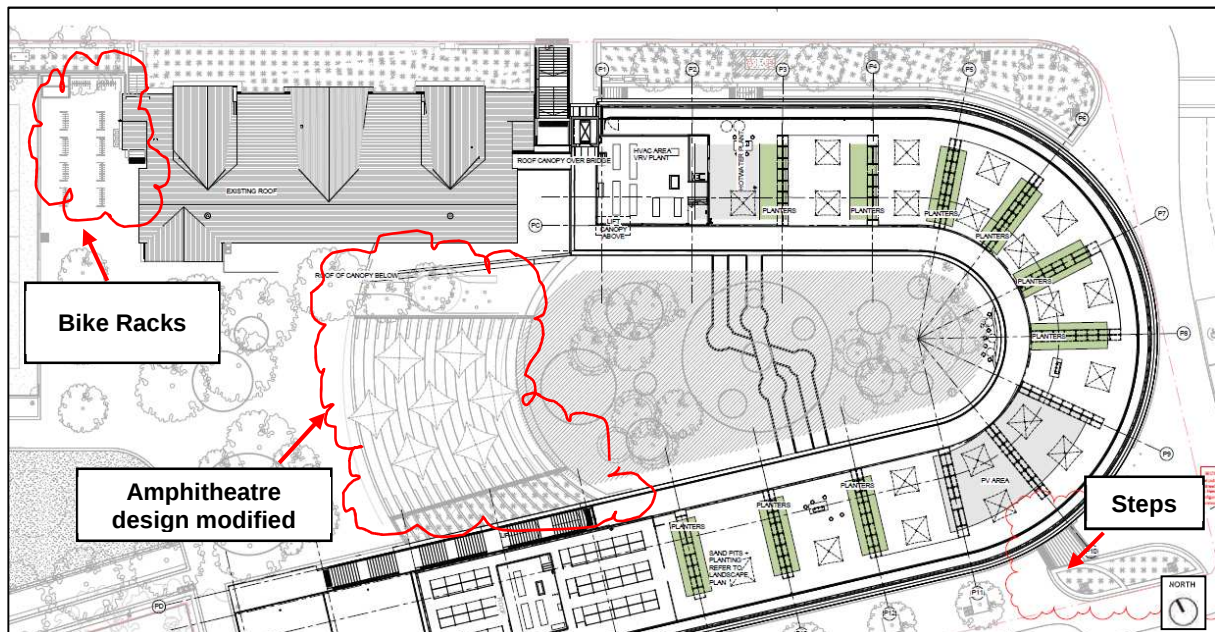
Proposed modifications to the landscaped areas within the PPS site (Source: Applicant's Modification 3 EIS)
